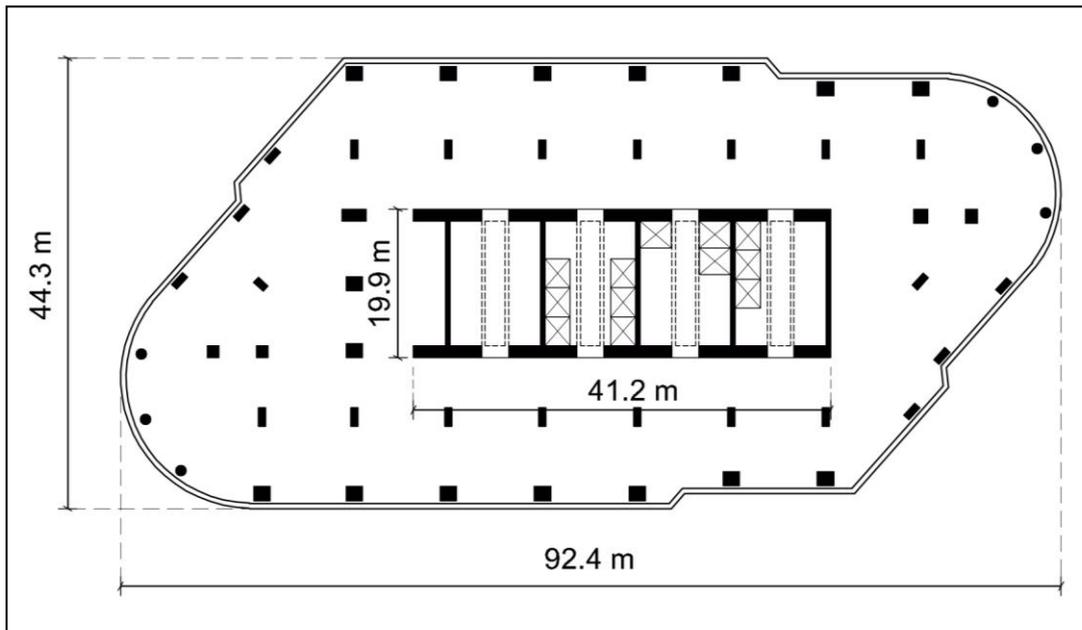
Typical Floor Plan (Drawing by Zeynep Keskin)
